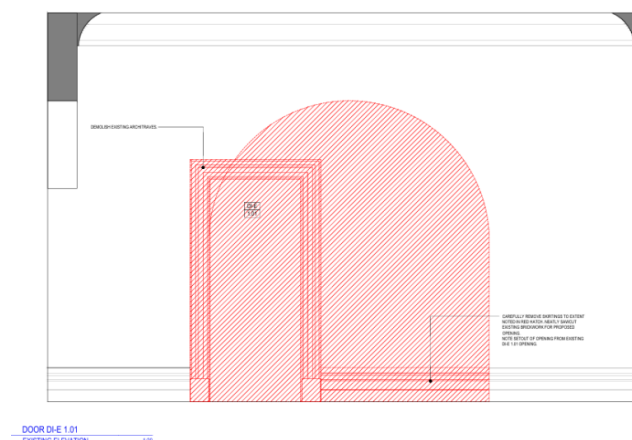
Elevation of new opening (Studio C+E drawing AD 1.05)
